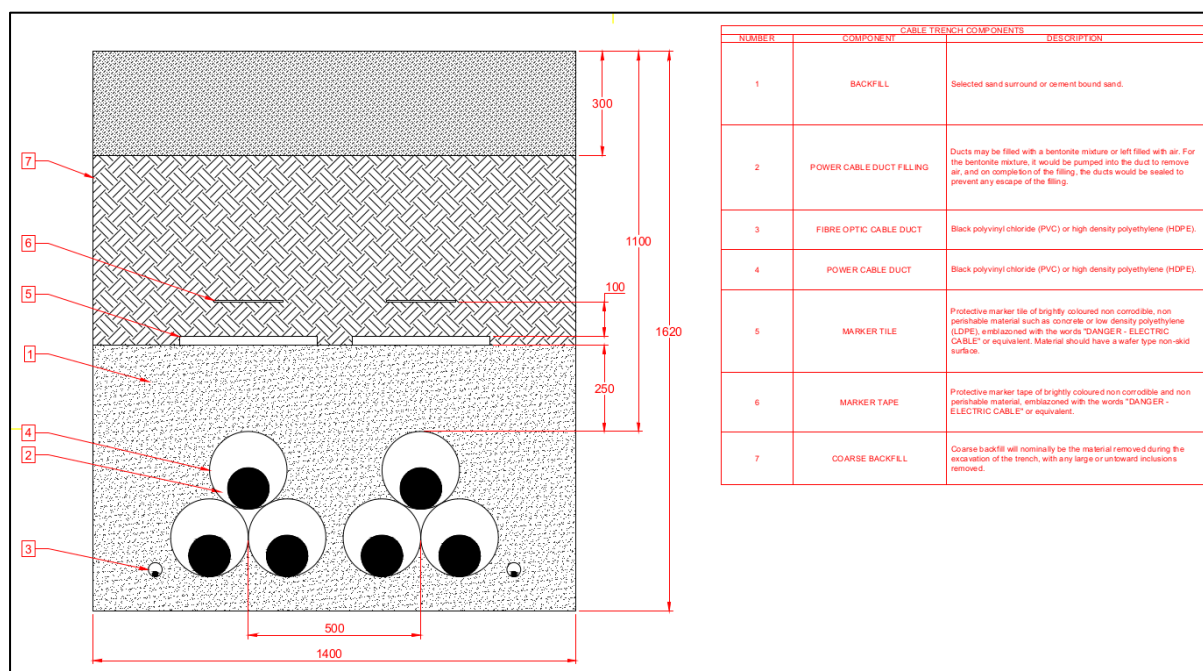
Cross-sectional diagram of an example trench with two 132kV cable circuits
